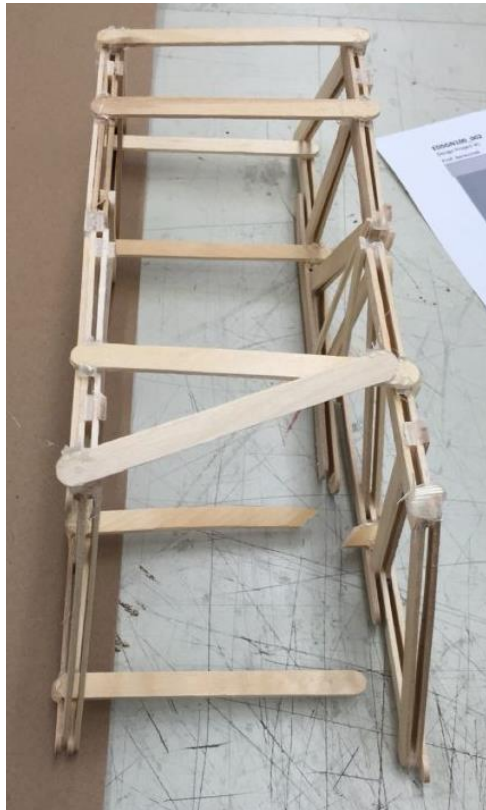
Howe Truss Bridge Prototype Failure after Load Testing
